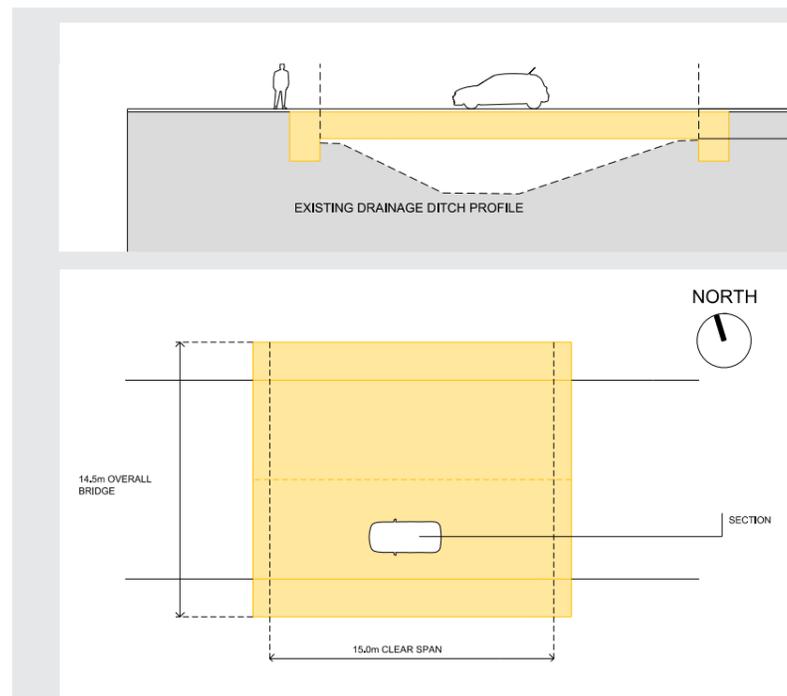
Illustrative plan and section of the new proposed access bridge over Enfield Ditch
